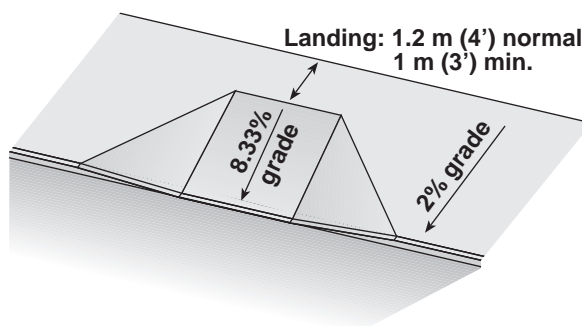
1 m (3 ft) wide area at 2% cross-slope on sidewalks.
